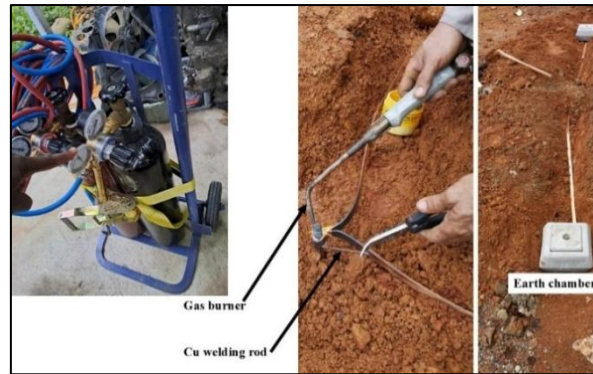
Oxy-acetylene welding equipment (left) and field execution of a copper tape joint to a ground rod (right)
